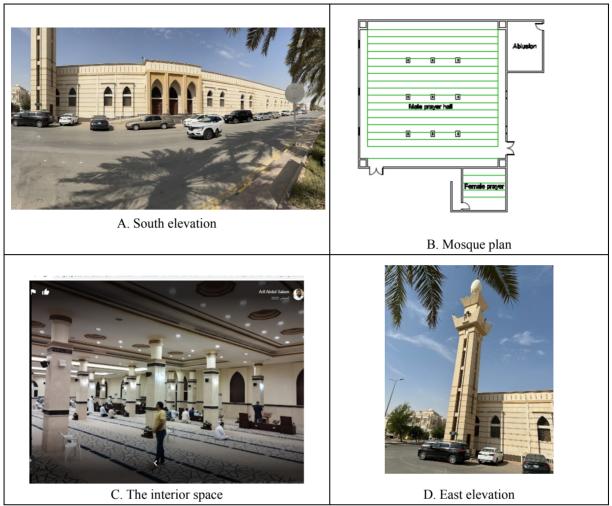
South elevation. B Mosque plan. C. The interior space. D. East elevation of case study one.
